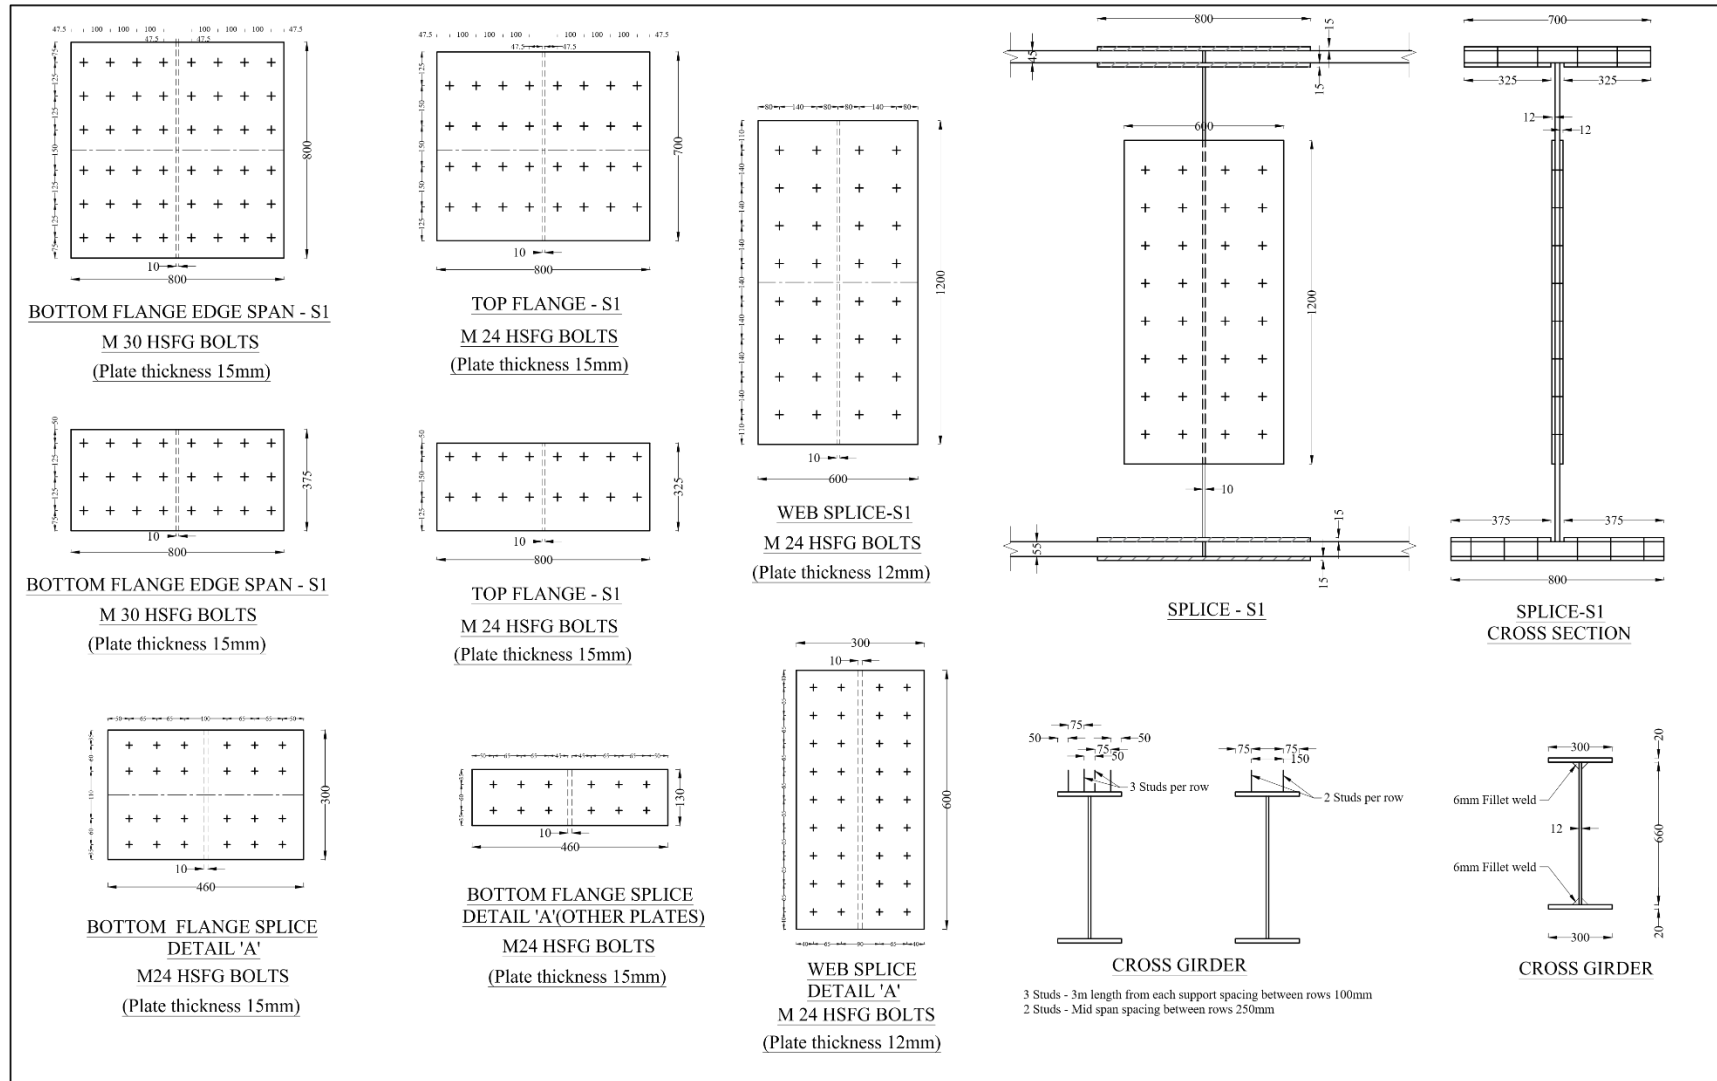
STEEL CONCRETE COMPOSITE LADDER DECK SPAN 40m
